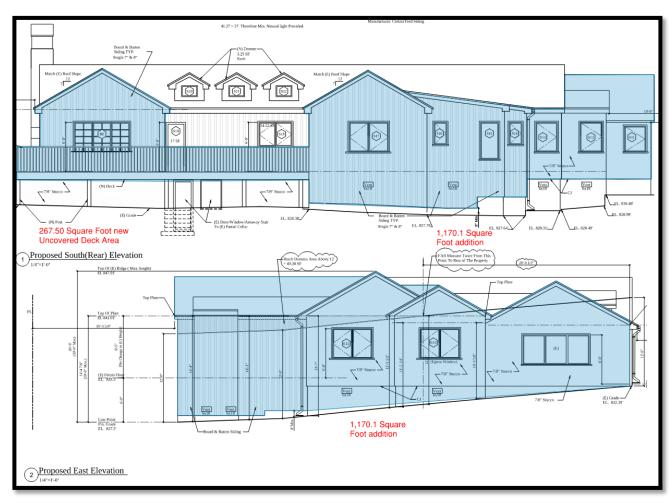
Elevation plan of the proposed development with additions shown in blue.
